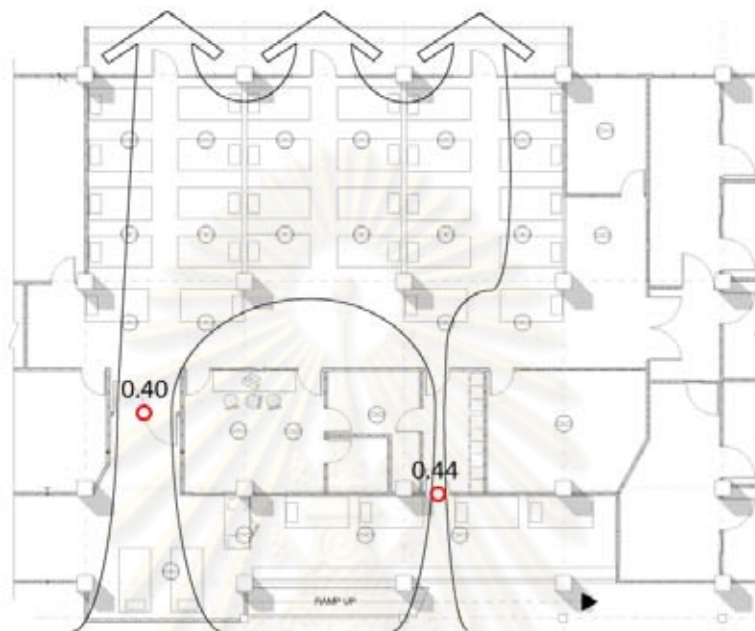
Floor plan and ventilation data of hospital A inpatient ward
